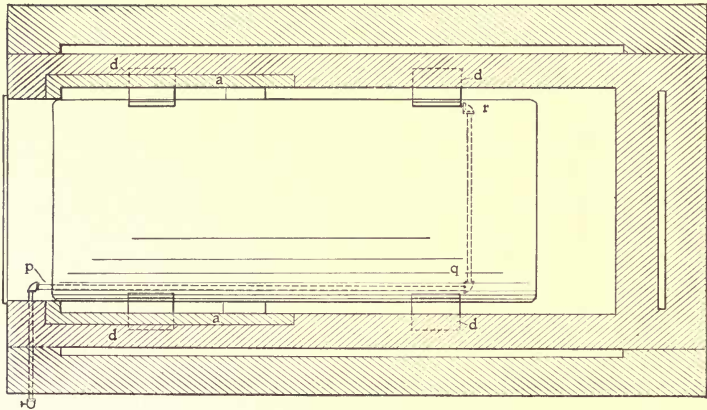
PLAN FOR SETTING A HORIZONTAL TUBULAR BOILER.
